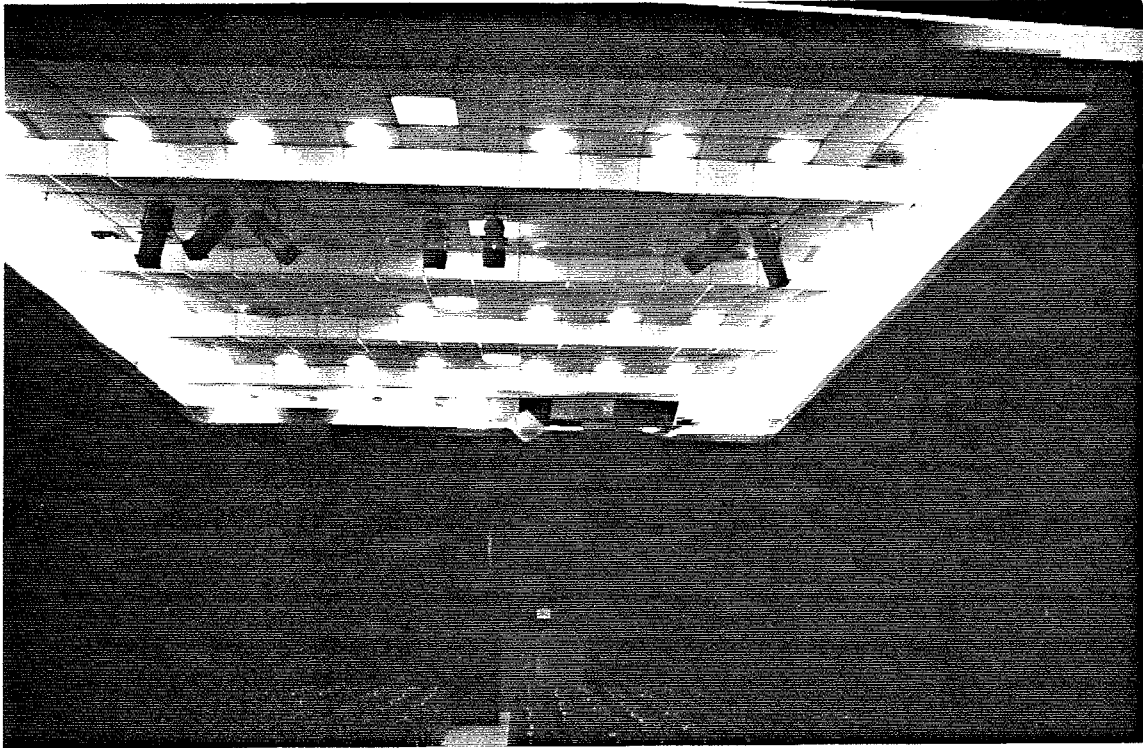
Damage to ceiling tiles and light fixtures of auditorium.
